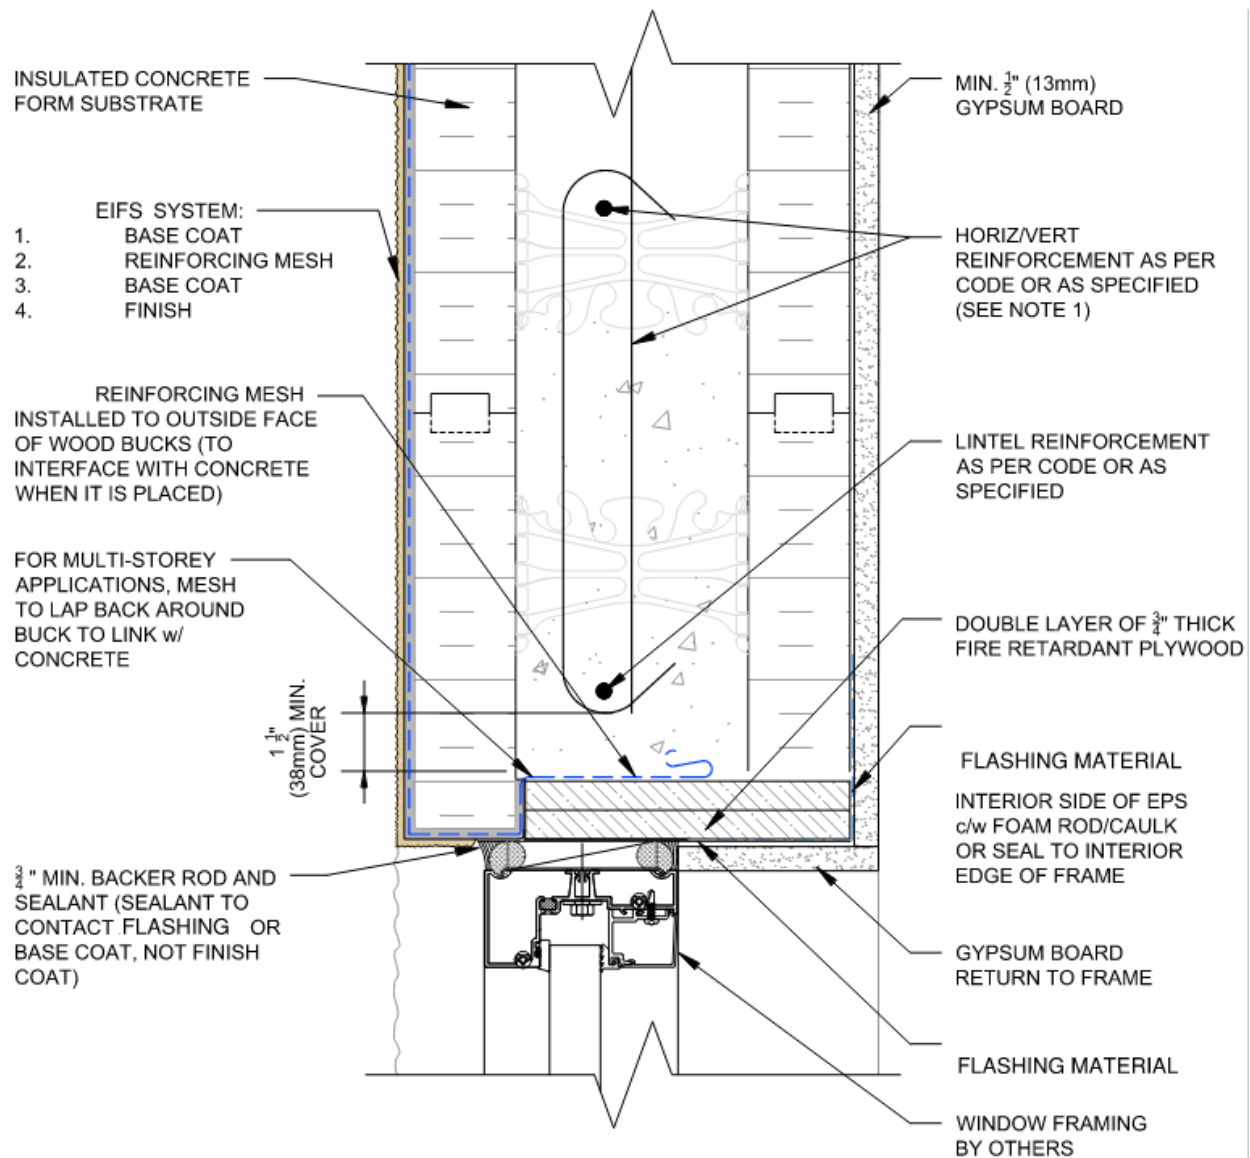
Exterior wall assembly incorporating EIFS reinforcement mesh detail at wall opening.
